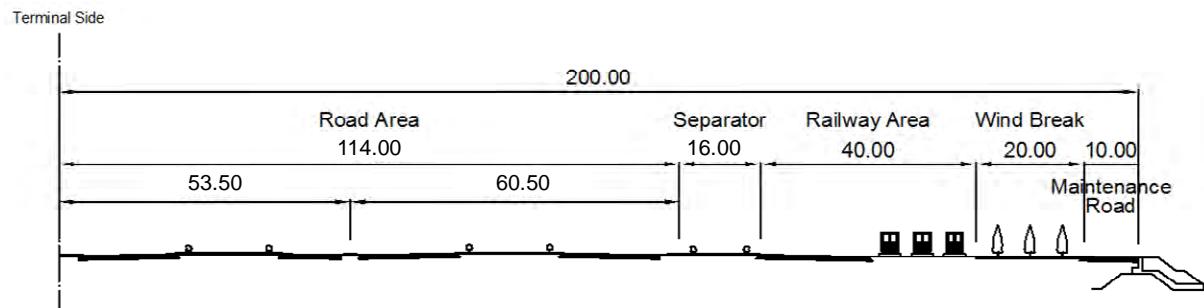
Typical Cross Section of Road and Railway Behind Terminal (Future)
